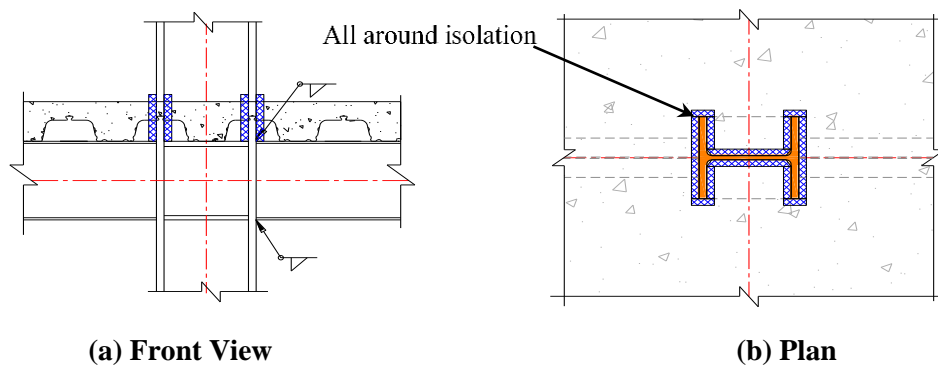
Welded Connection – Slab Isolation Details
